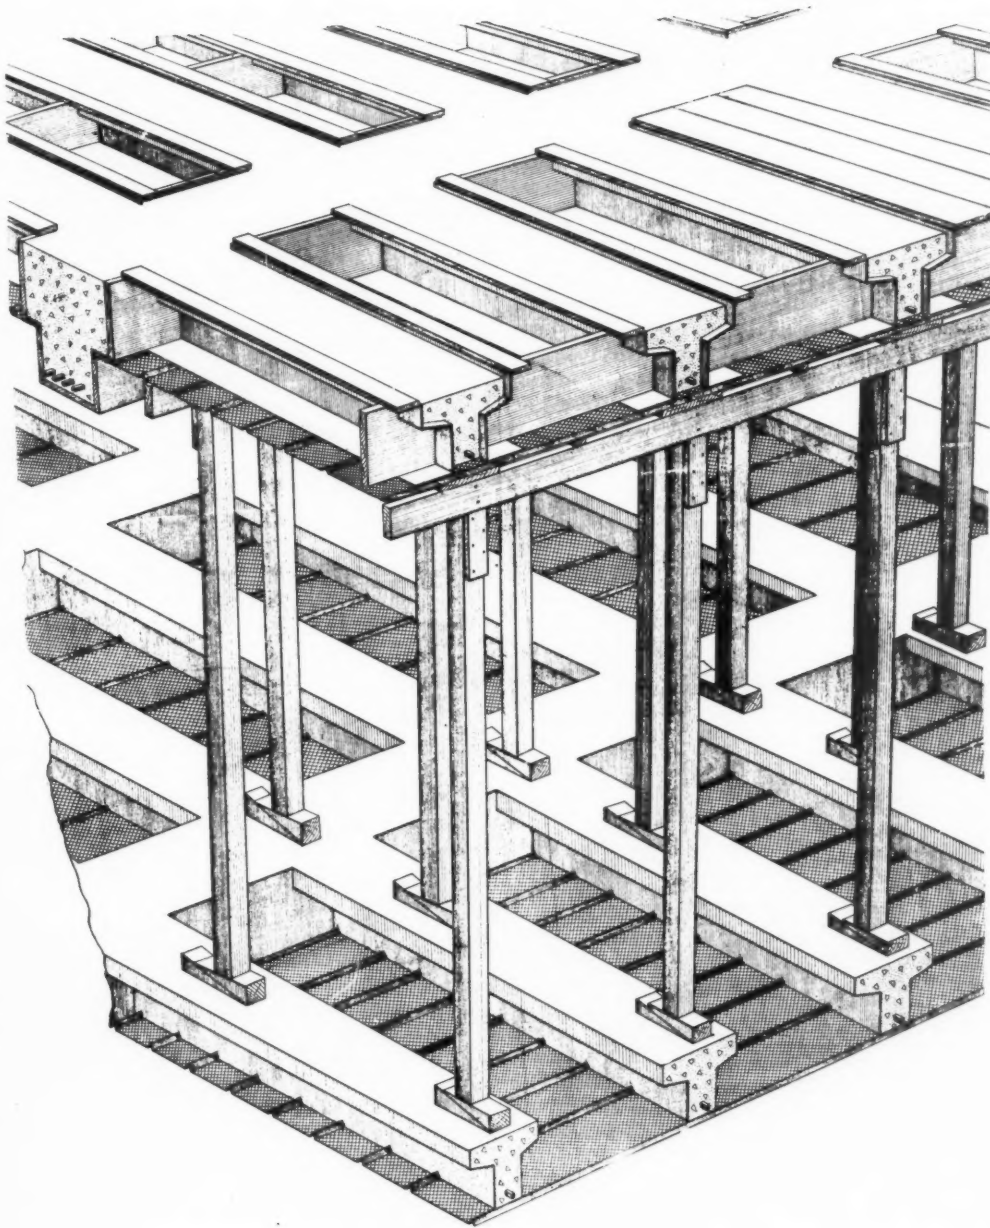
FALSE-WORK CONSTRUCTION DETAILS
